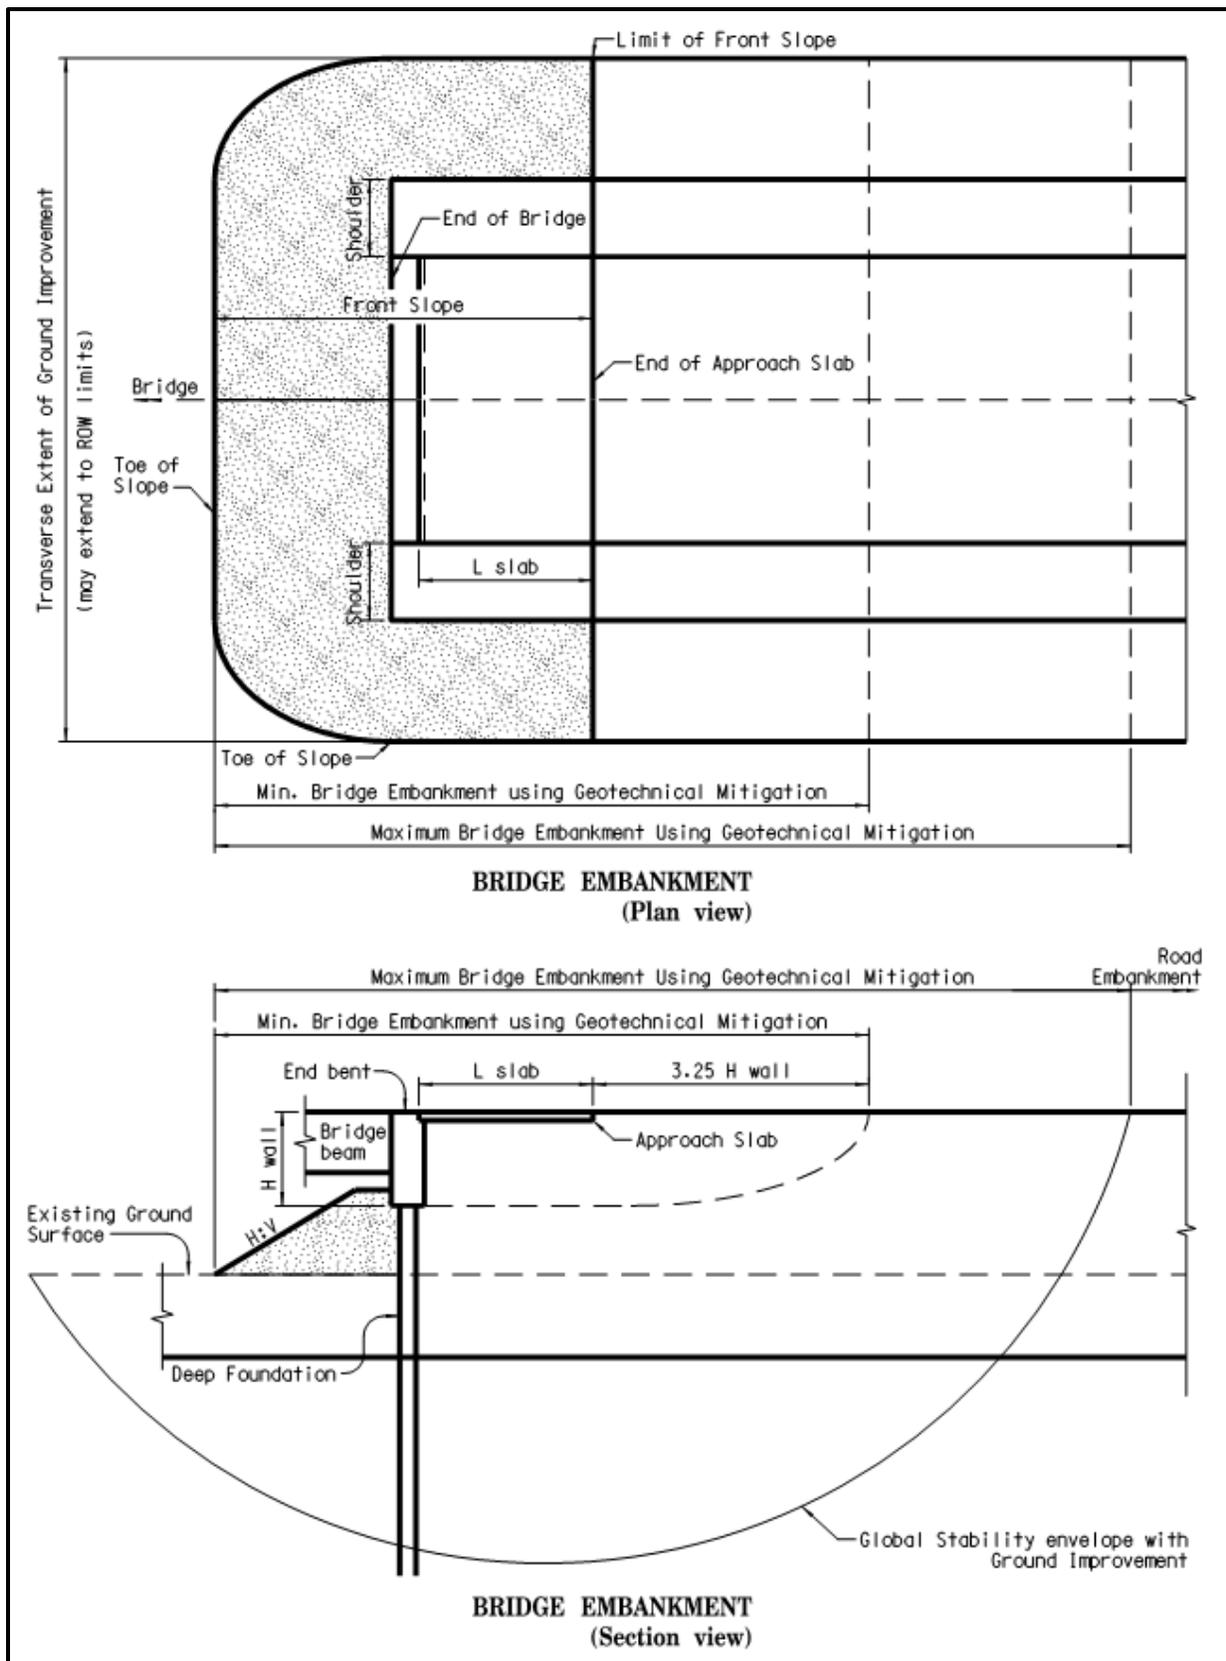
, Bridge Embankment using Geotechnical Mitigation
